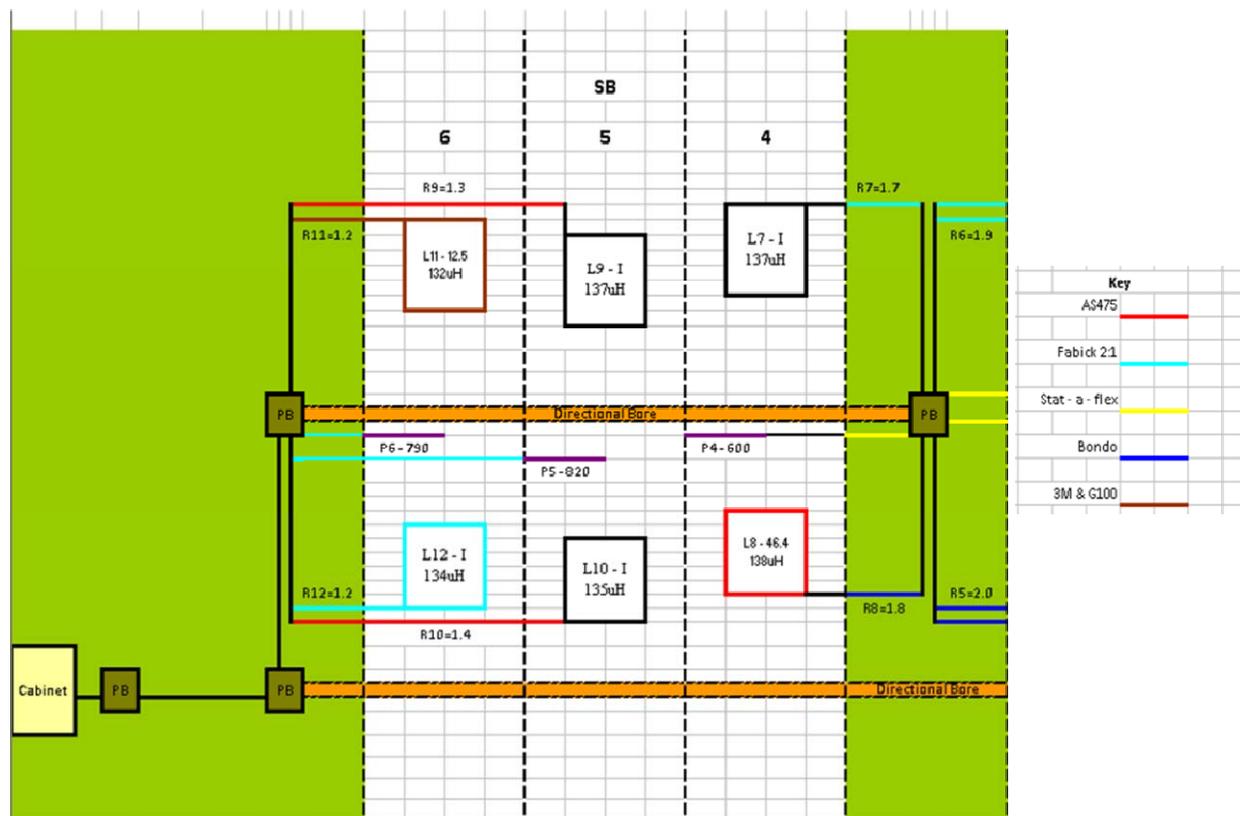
Loop Layout for Southbound Site 112 on I-75
